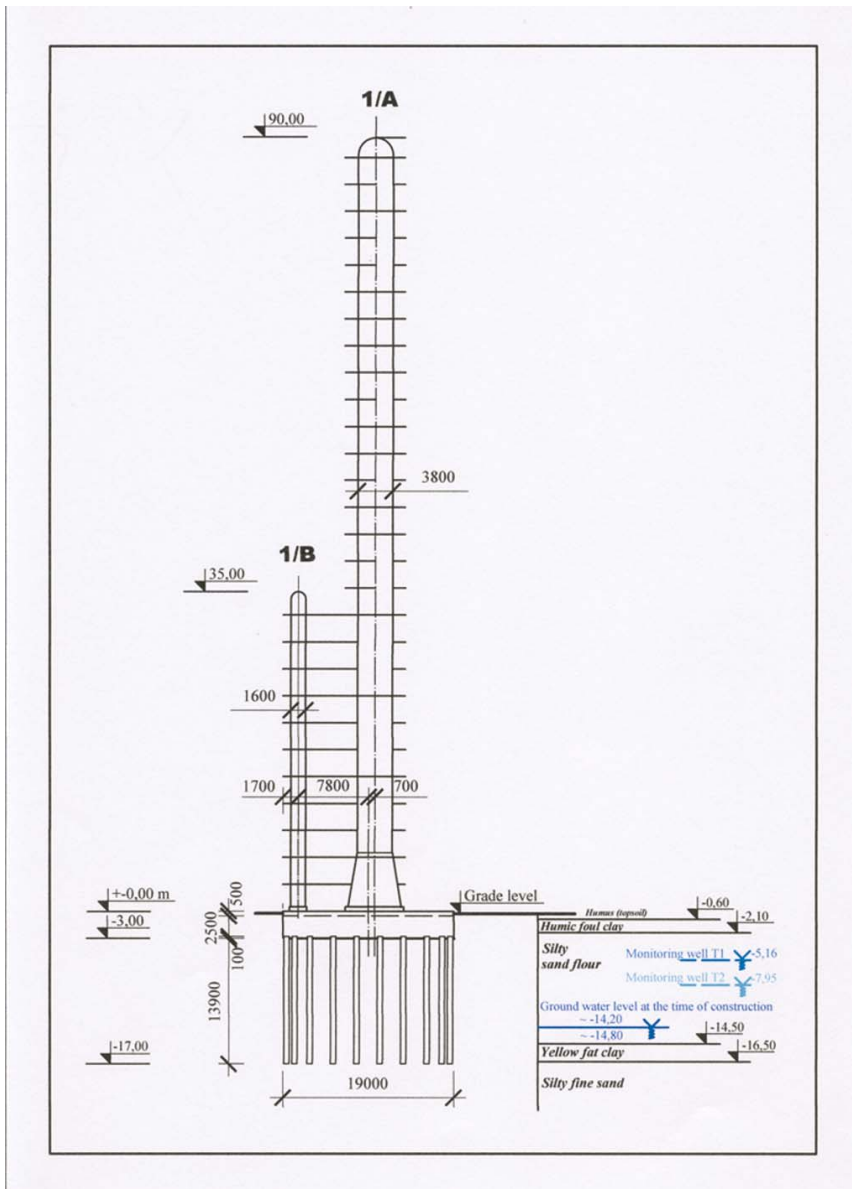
Side view of towers 1/A and 1/B, soil and ground water conditions
